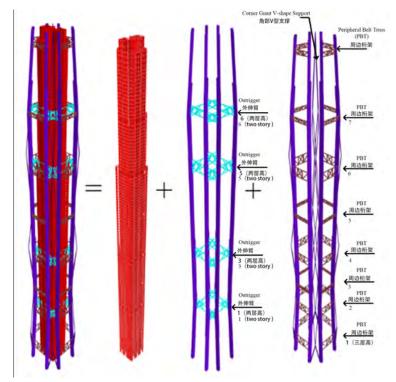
Tower Structural System. (Source: Yuqi Zhou) 图6.16. 塔楼结构体系 (来源: 周予启)
